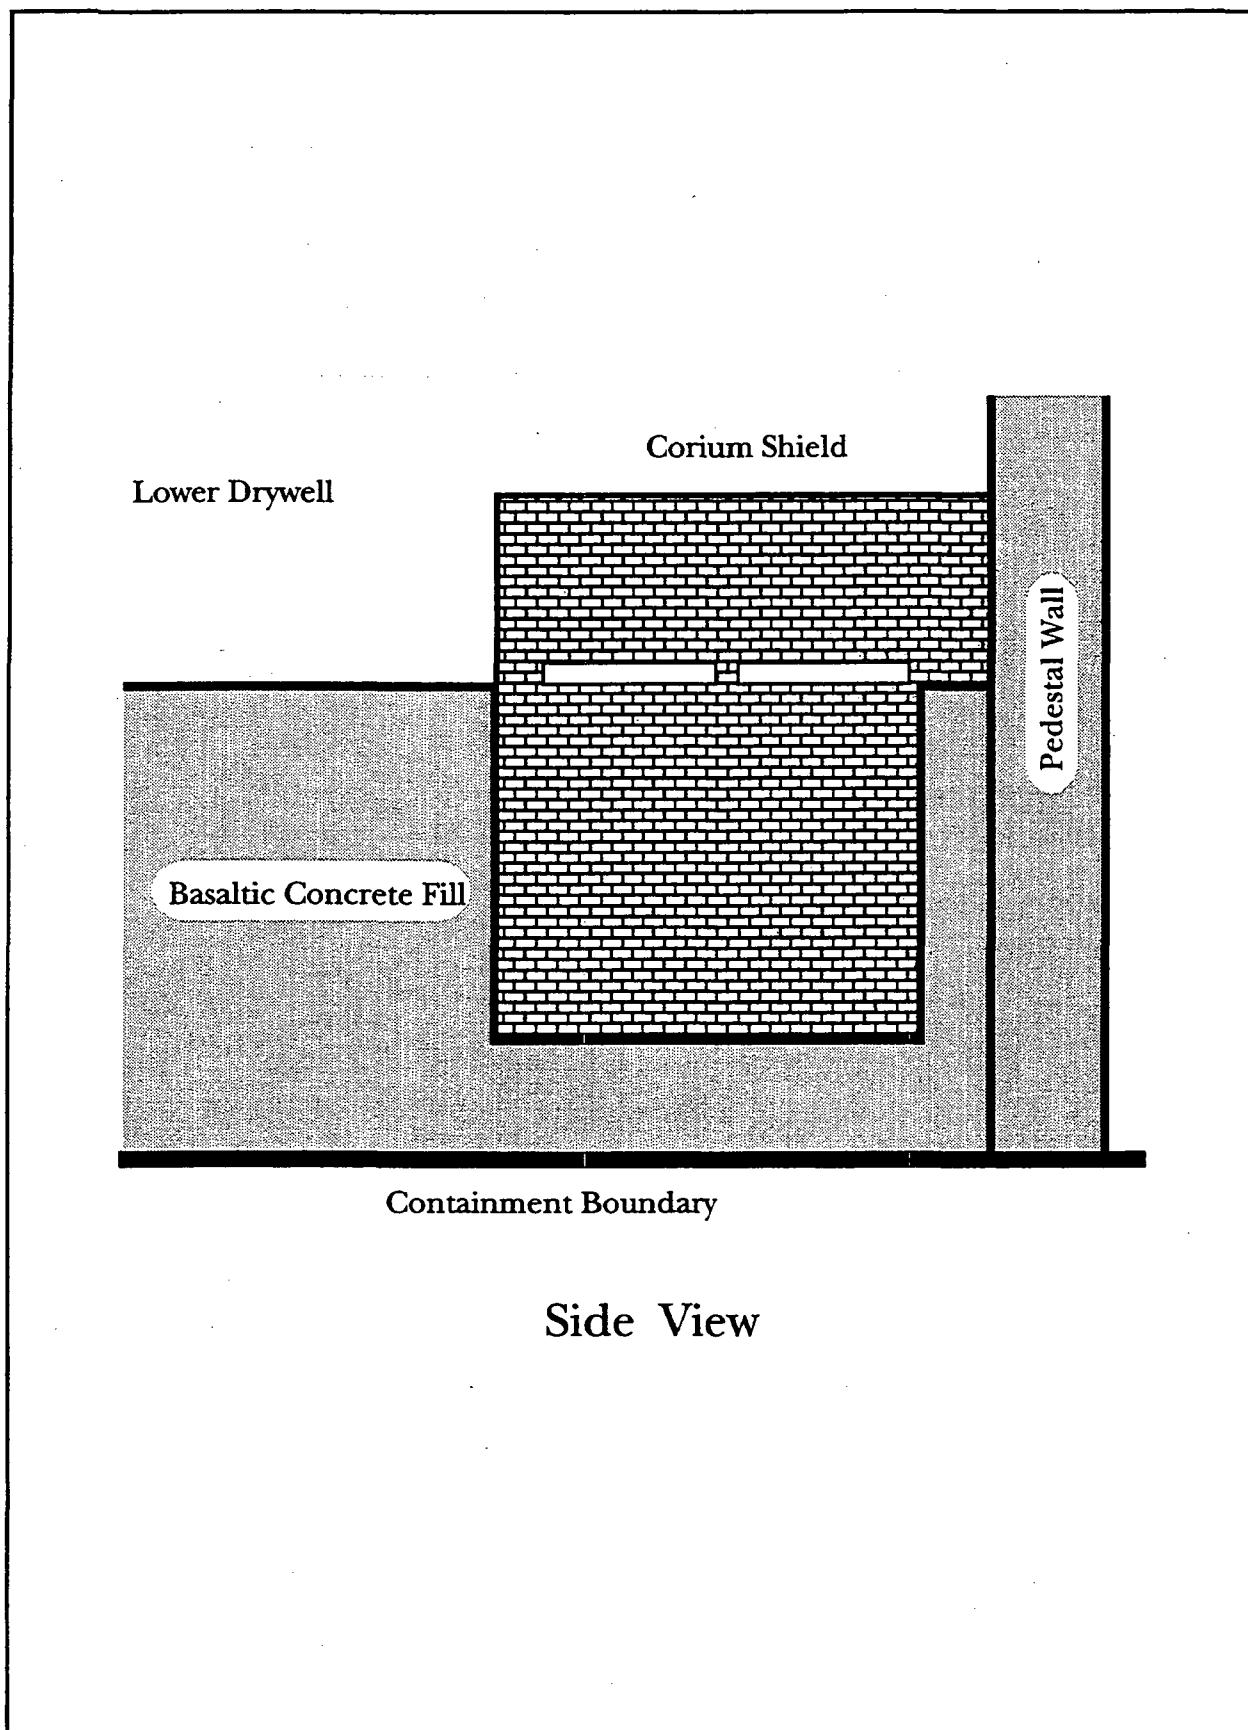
ED-1 Conceptual Design of Lower Drywell Floor Drain Sump Shield
